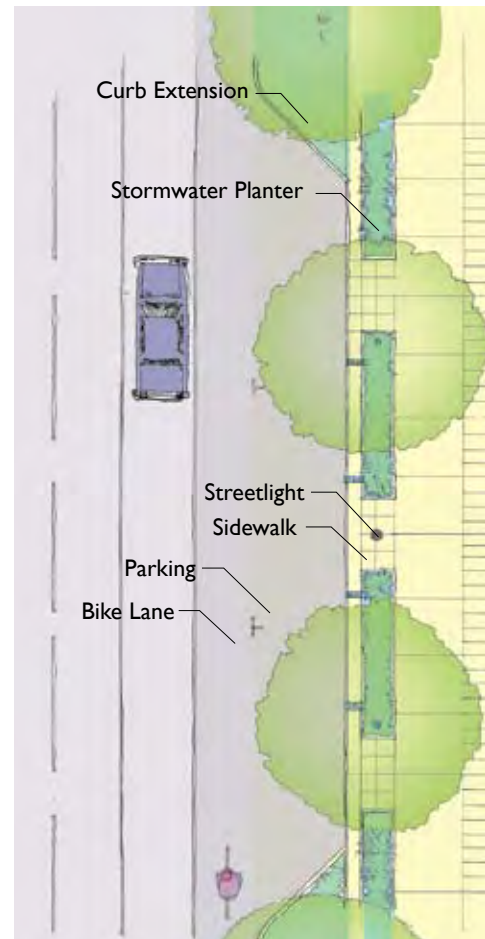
Enlarged Plan with Street Elements and Stormwater Planters
